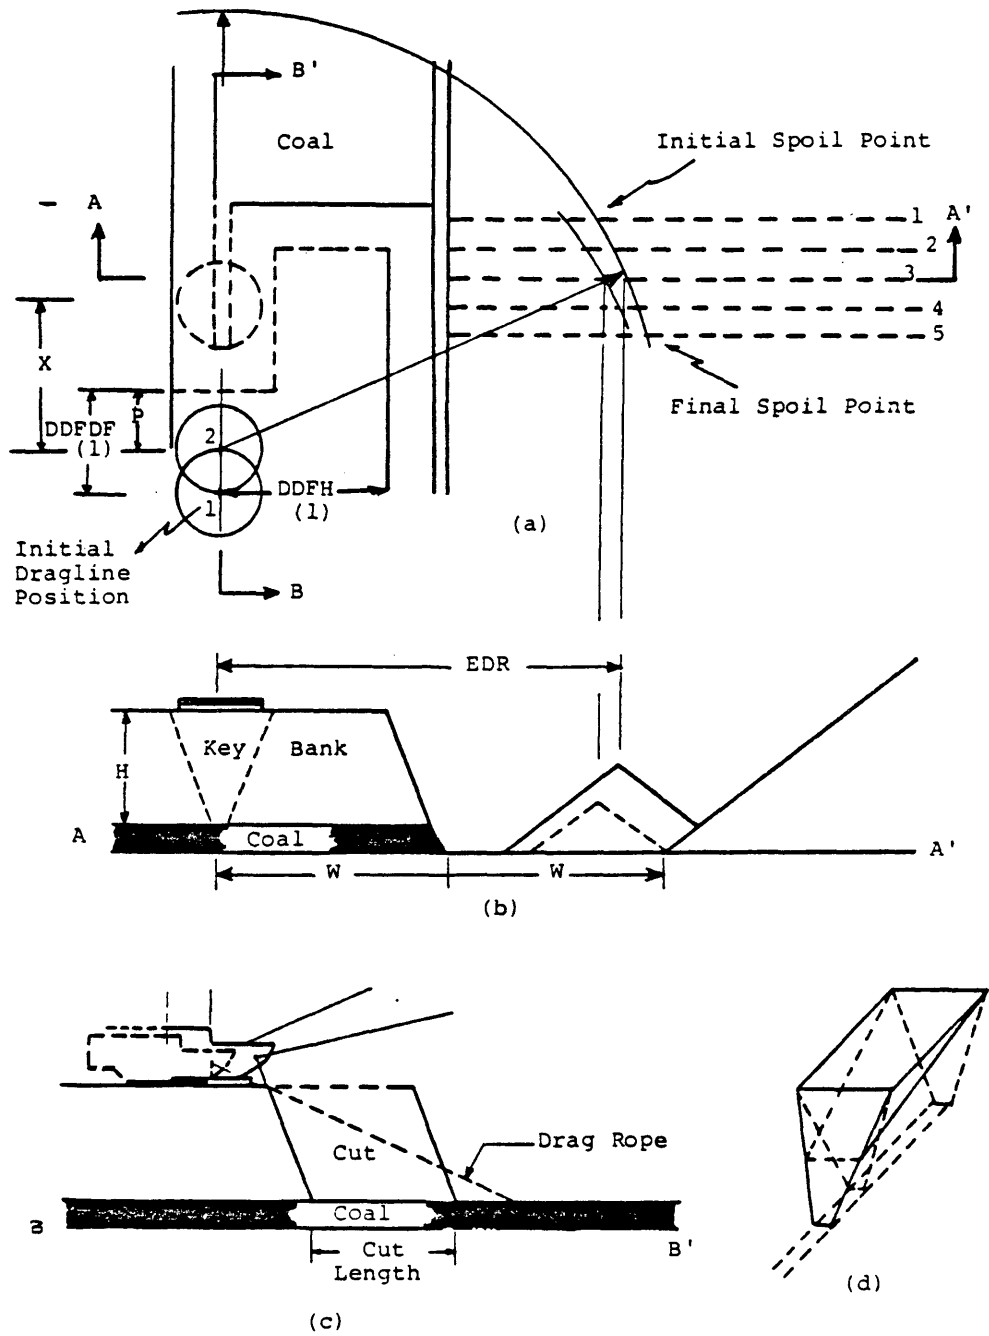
Plan and Cross Sectional Illustrations of the Pit Geometry for the Key Cut Removal for the Side Casting Model.
